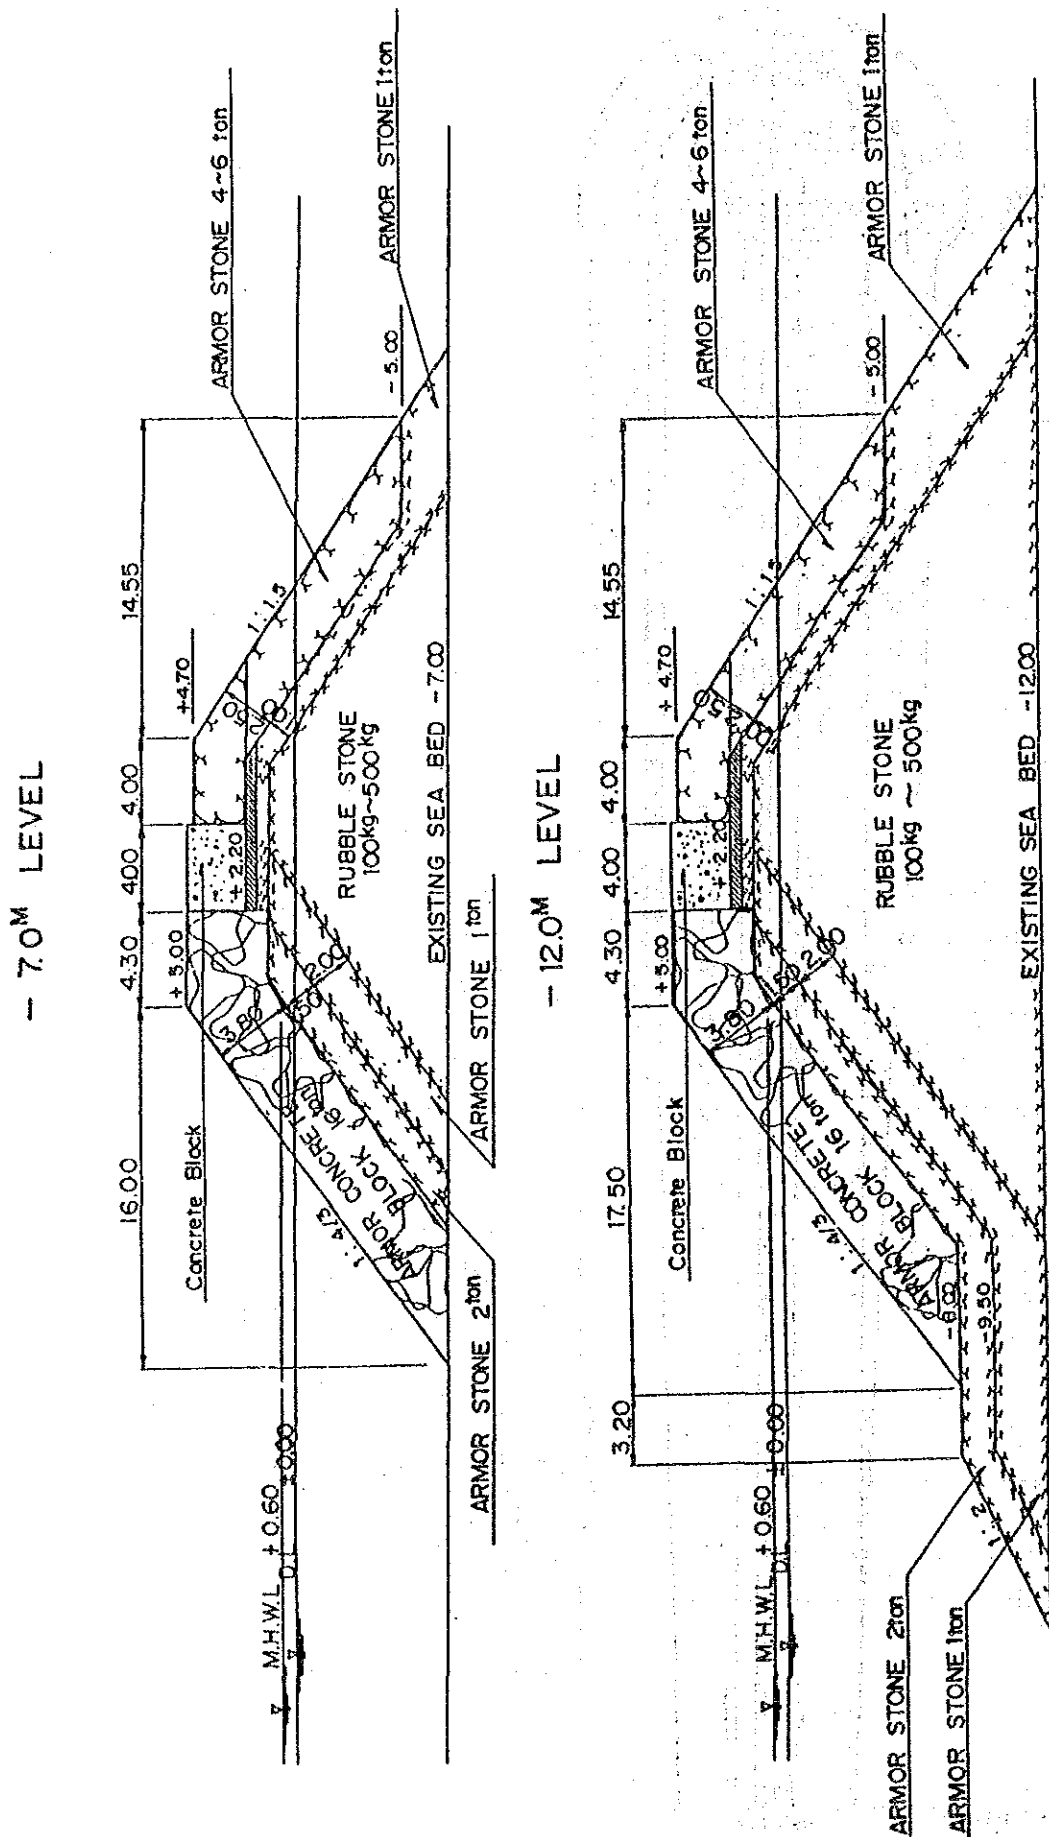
Typical Cross Section of Southwest Breakwater
